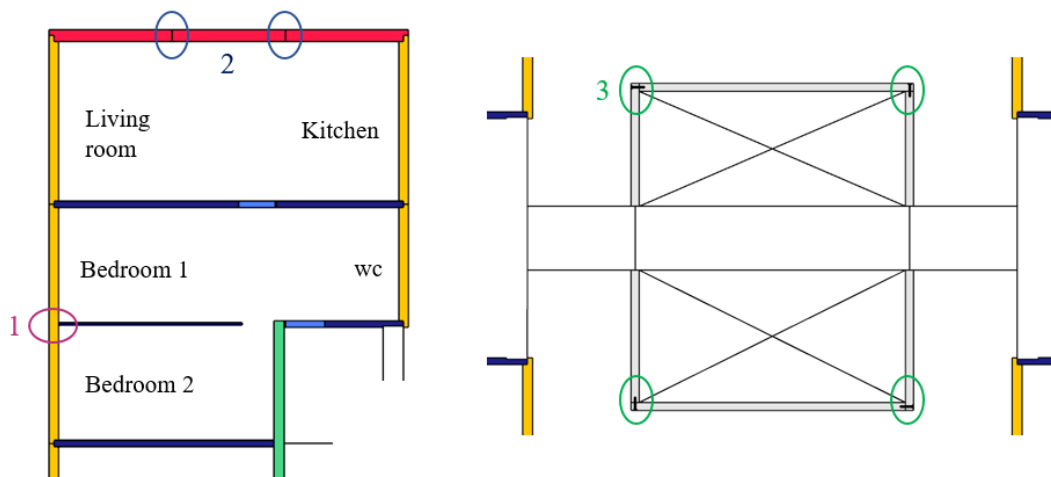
Approximate floor-plan of a two-bedroom flat; locations of the primary ‘cracks’ reported are marked (LHS). Approximate floor-plan of the lift and stair core, showing the locations of the primary ‘cracks’ reported (RHS)
